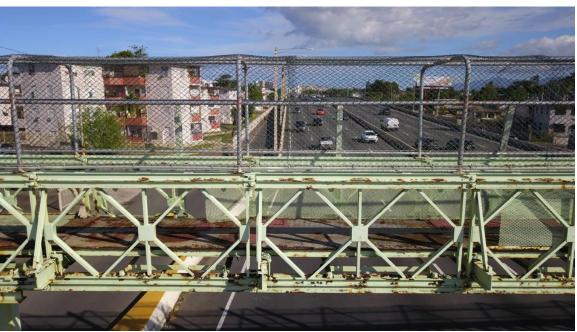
Corrosion in Truss Element (Example 1)
